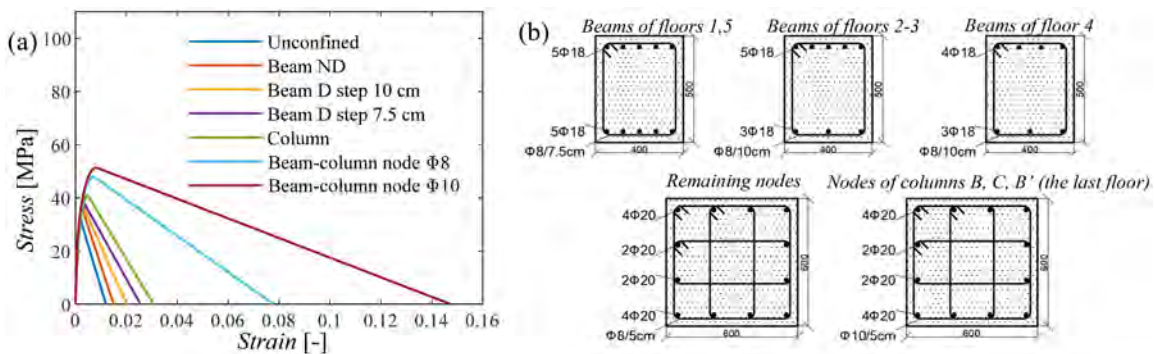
CPE + springs* model: (a) Constitutive laws of concrete in compression; (b) longitudinal and transverse reinforcement of the dissipative area of the beams in the cross-sections of Figure 3a and in the beam-column nodes.
